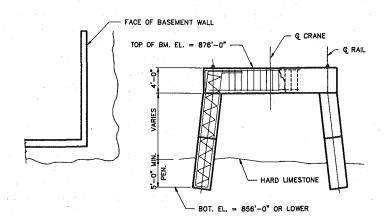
Support System for North Crane; Longitudinal Beams and Rails Not Shown for Clarity (Typical) (Note: Drill 32 in.  $\varphi$  Pier and Use Sonotube to Break Bond with Adjacent Soil for Top 8 ft of Pier)
